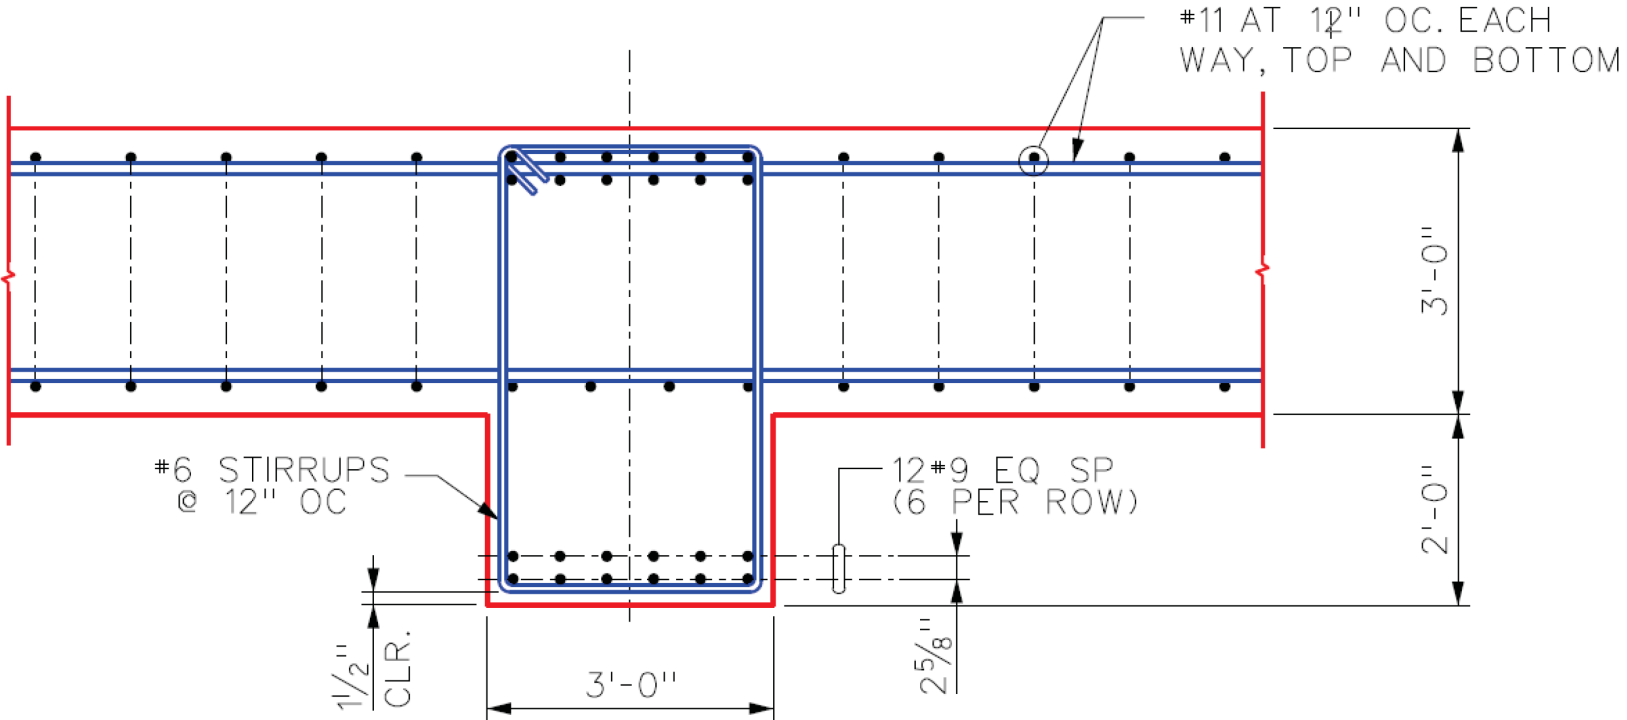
B-85: CRB Reinforcement Detail for T-Beam (Type 2) at EL. 120'-0"
